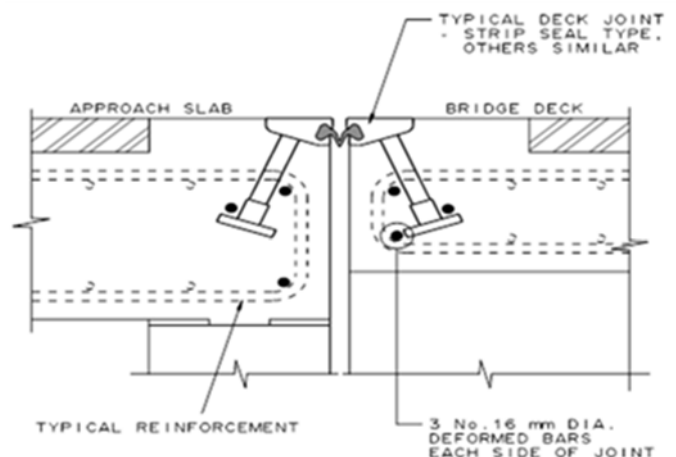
Typical deck joint showing minimum transverse reinforcement.
